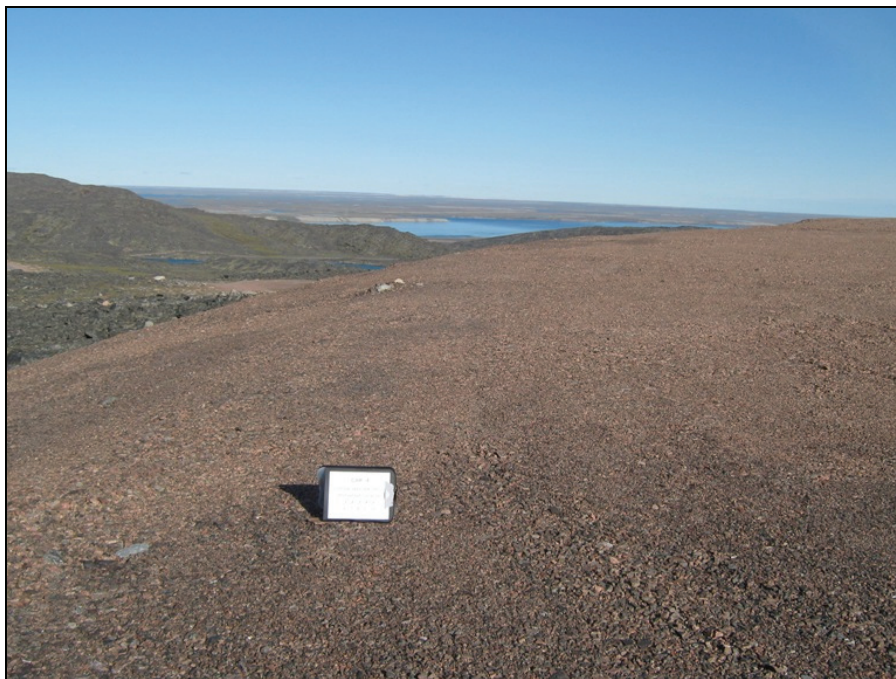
B. Northwest corner crest, facing east____ ↑
